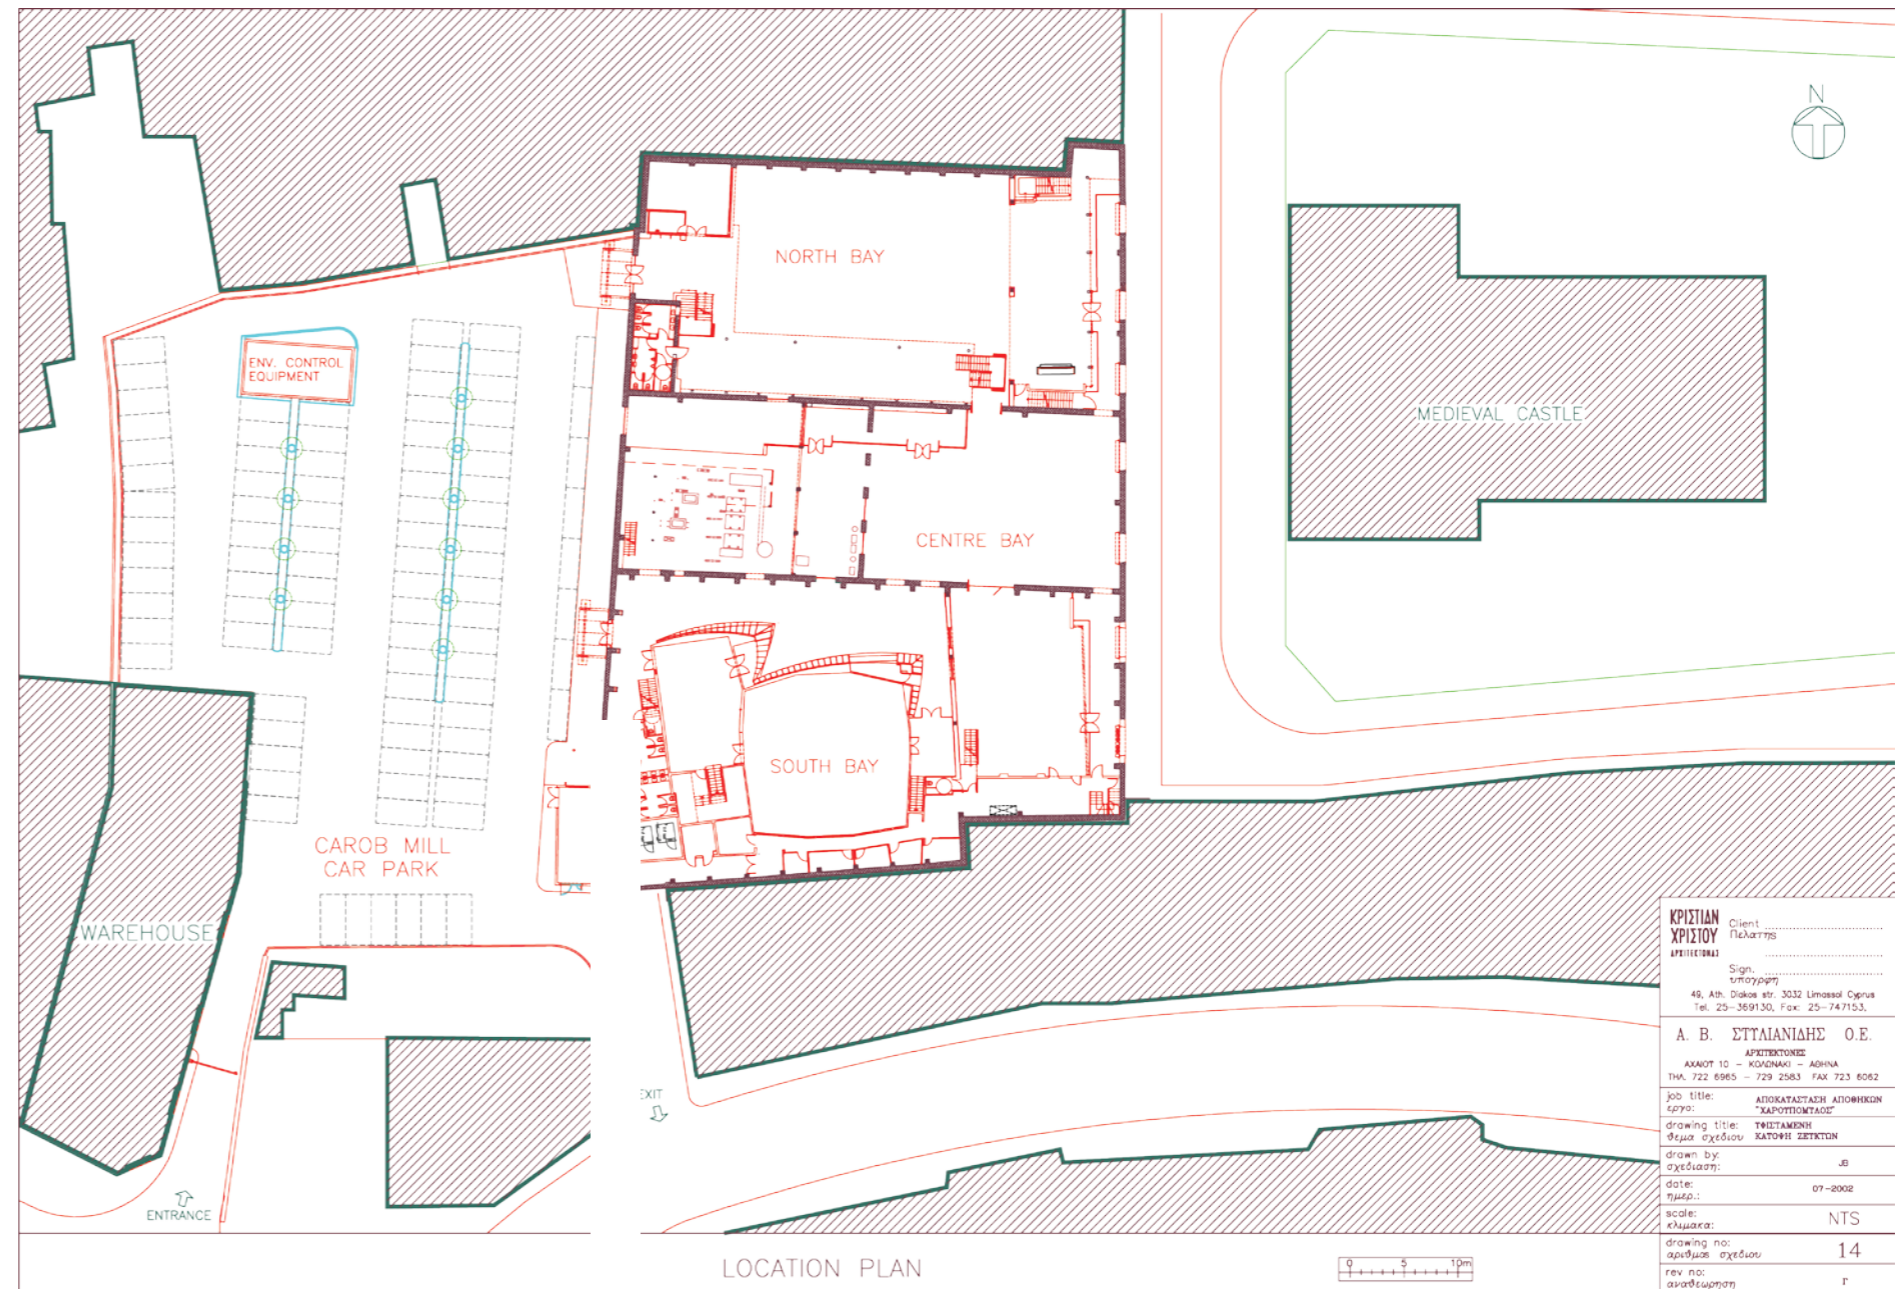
Location plan. © Kristian Christou Architects, A. J. Brooks, Architect.
